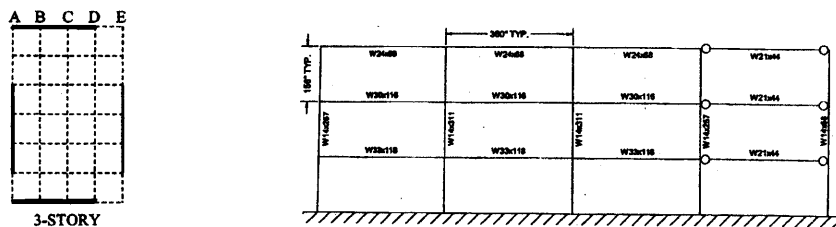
Floorplan and elevation views of the original structure. Taken from [3] and [5].
